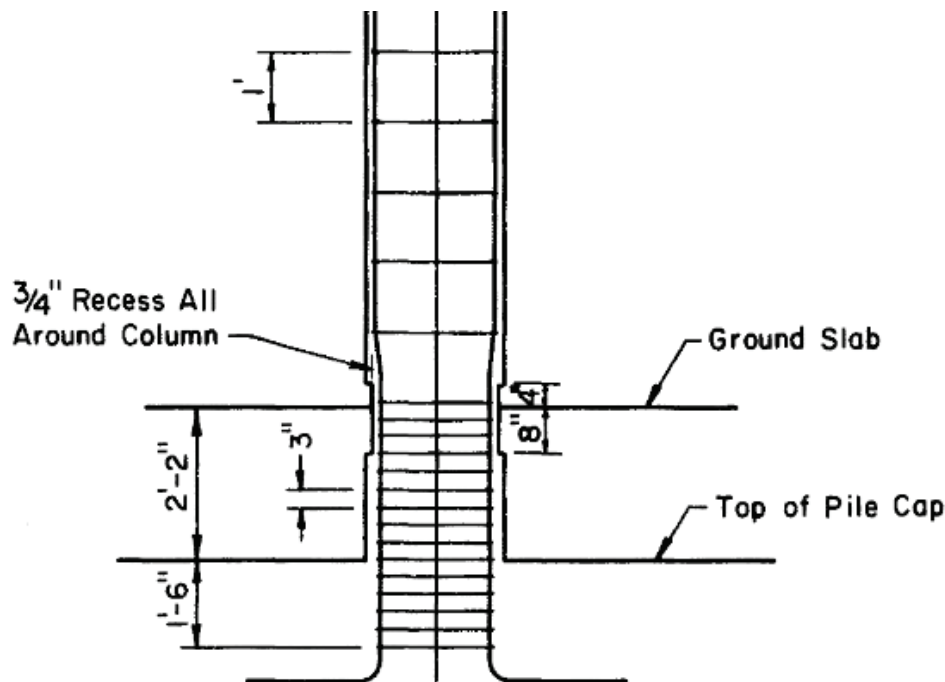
Details of typical first-story column base connections into the pile cap (Kreger and Sozen, 1990). First-story columns have 24 in. by 24 in cross-section.
